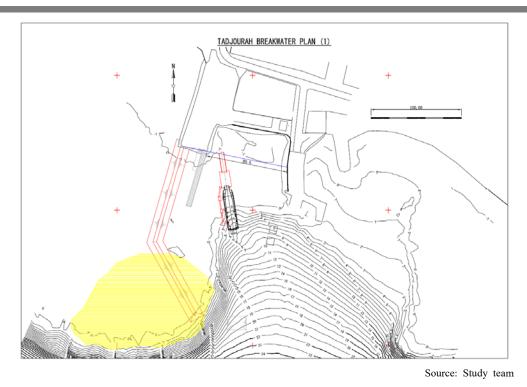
Breakwater construction design in the Tadjourah port (Alternative 2)
